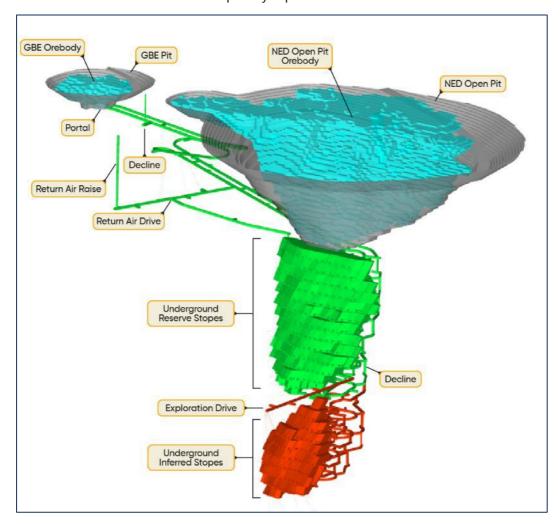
GBE Pit and Underground Mine Design – Looking East
